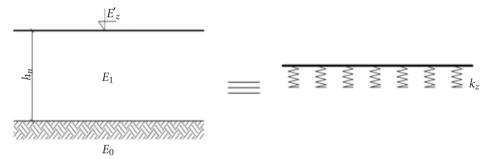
Pavement diagram after taking into account the degree of wear of existing bituminous pavement
